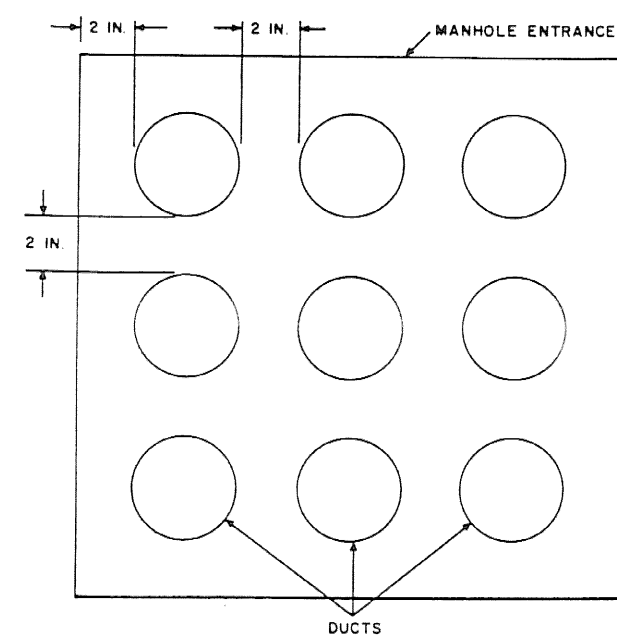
Separation of Ducts of Manhole and Cable Vault Entrances
